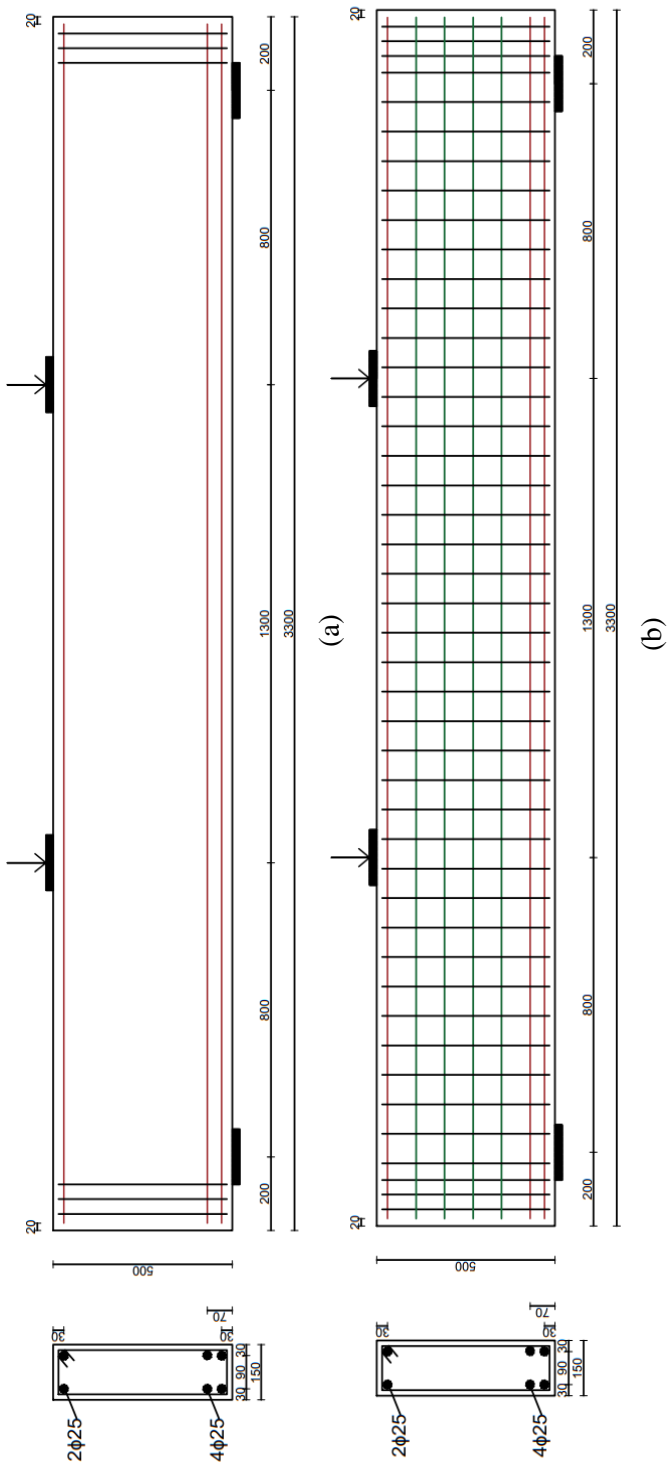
Details of deep beam specimens of group S (dimensions are in mm): (a) A beam without traditional shear reinforcement; (b) A beam with traditional shear reinforcement
